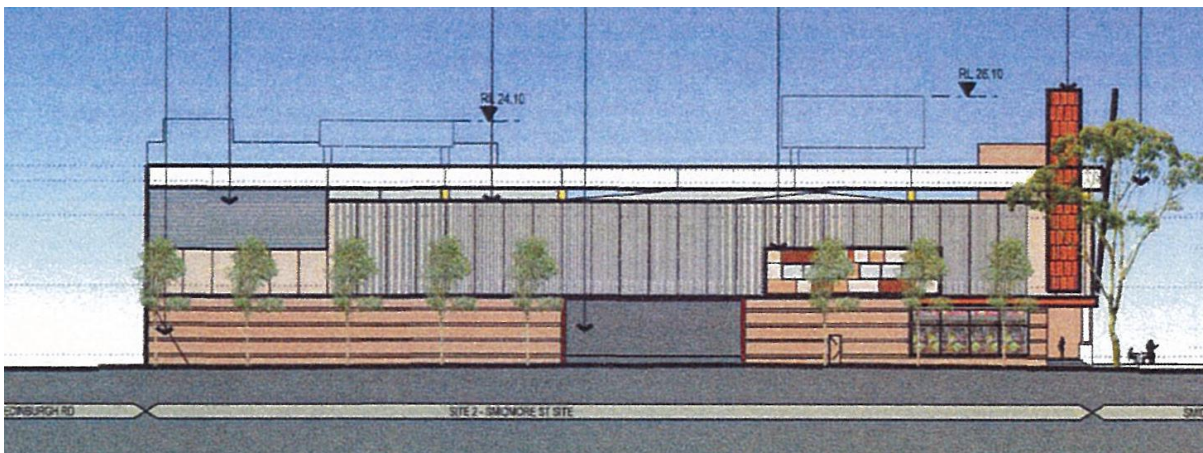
PROPOSED MURRAY STREET ELEVATION
